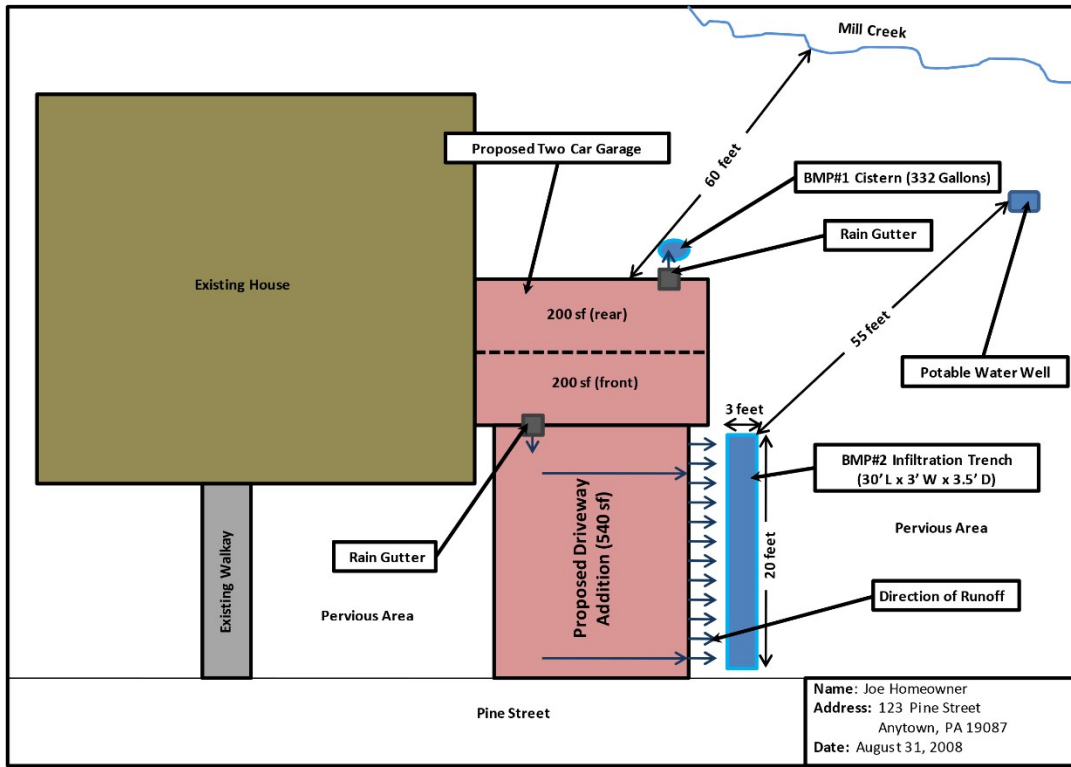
Example of Simplified Stormwater Management Site Plan for Joe Homeowner
